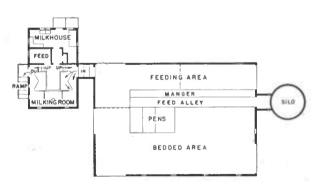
A general-purpose barn remodeled and adapted for loose housing. The milking plant which completes the layont is new.
